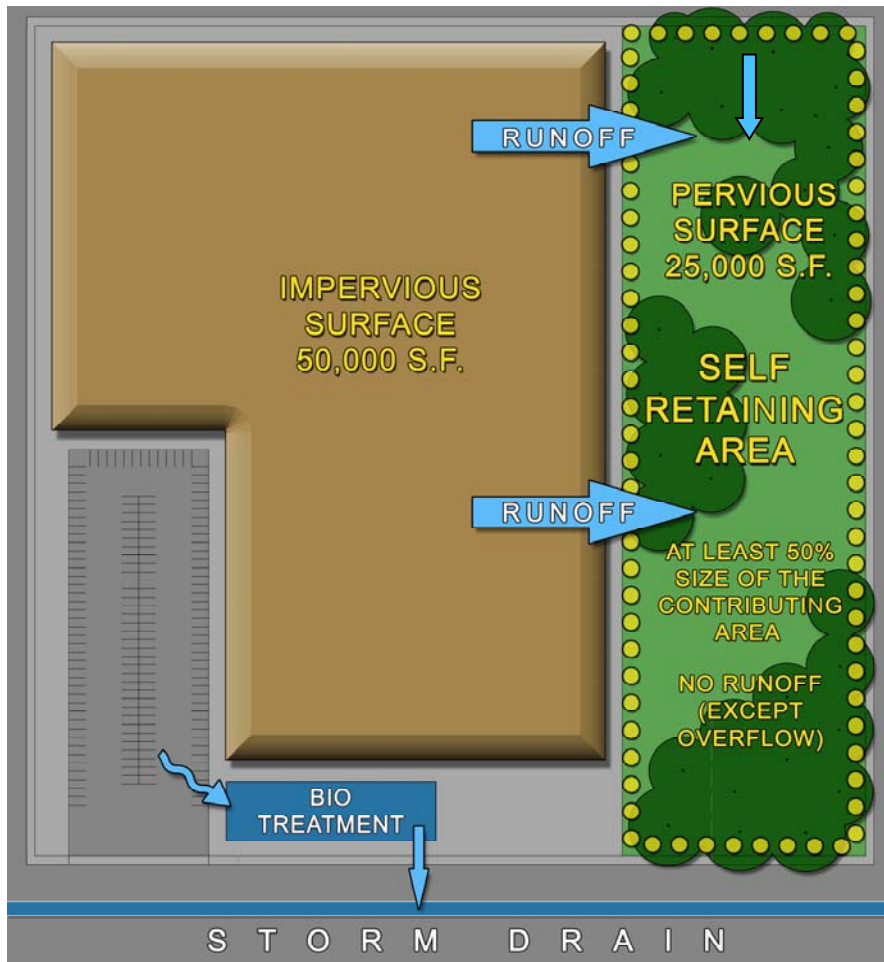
Schematic Drainage Plan for Site with a Self-Retaining Area
